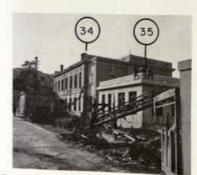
Group 26, Building 31. Looking was a damaged, but still standing, portion of arched and inc.
